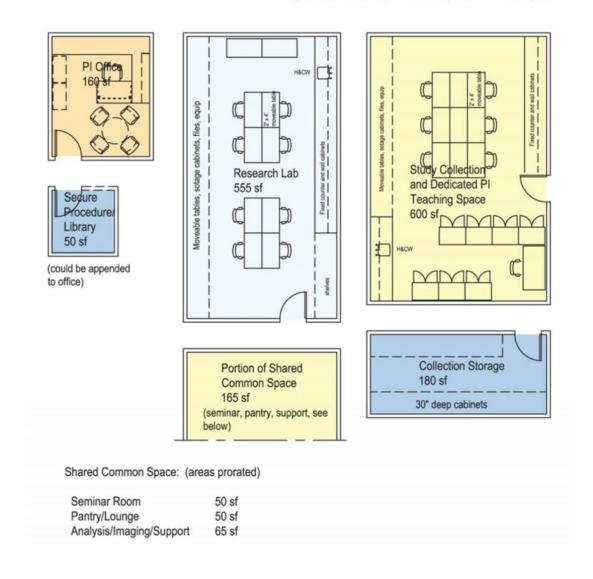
Typical Dry Laboratory Layout with addition of Teaching Space ~1,710 sf per PI
